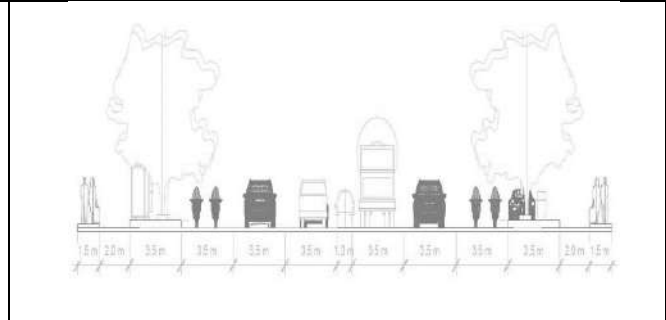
Proposed Road for Vapi Char Rasta – Dadra Section
